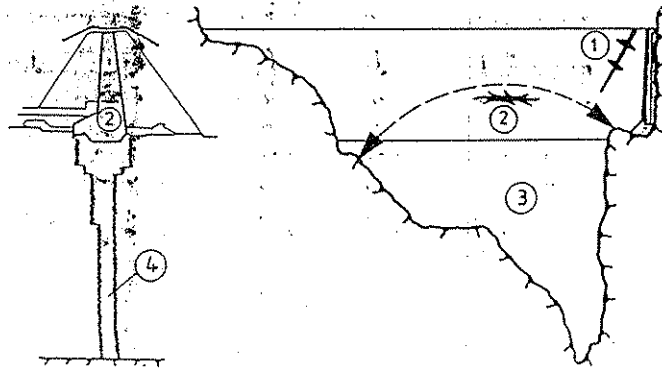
The Sylvenstein gravel dam. Probable cracking of the core due to arching (adapted from Beier et al. 1979).
